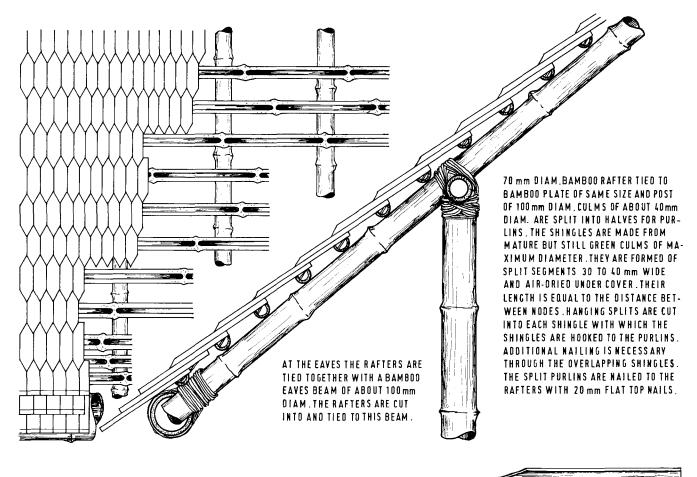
BAMBOO SHINGLE ROOF CONSTRUCTION, EAVES DETAIL AND VIEW OF SHINGLE COVER AND SUBSTRUCTURE - FROM :"THE USE OF BAMBOO AND REEDS IN BUILDING CONSTRUCTION ", U.N., ST / SOA / 113.
